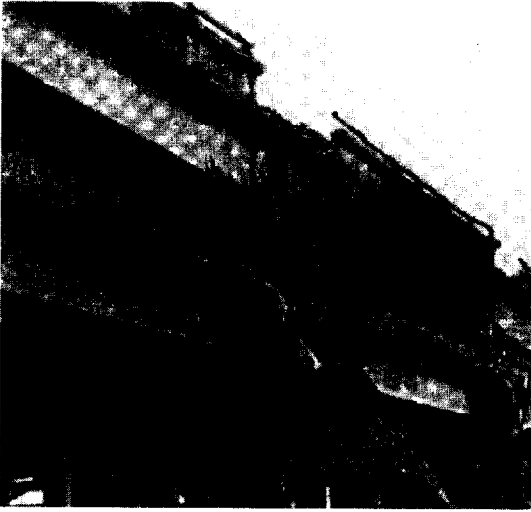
Anchorage failure for cap beam reinforcement, Cypress viaduct, 1989 Loma Prieta earthquake
